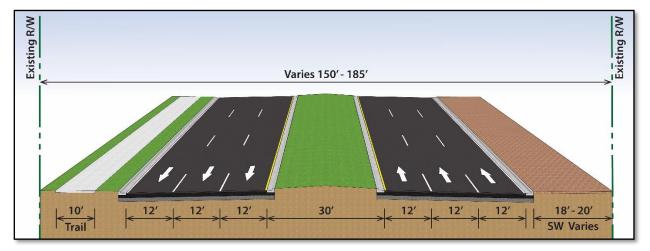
Existing Typical Section – Meridian Avenue – Cumberland Street to Kennedy Boulevard
